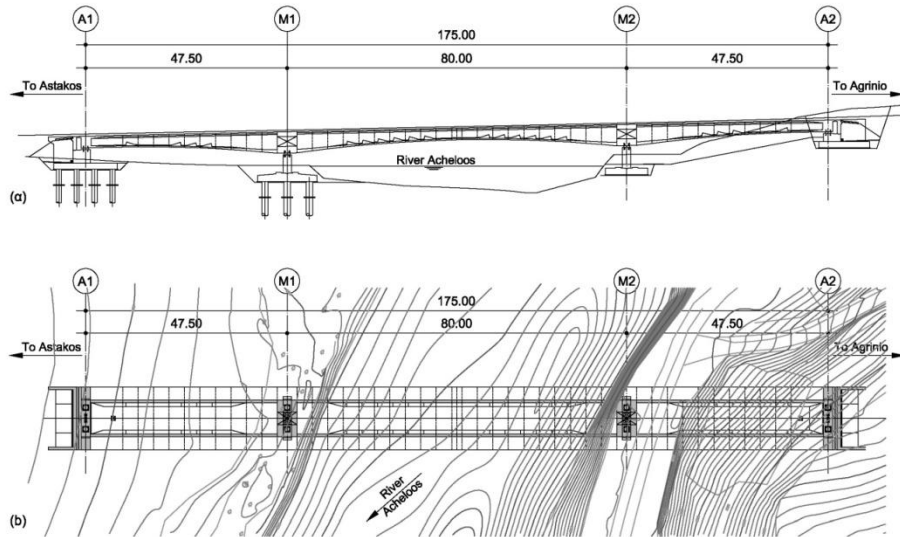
Elevation (a) and plan (b) of the new Acheloos Bridge.
